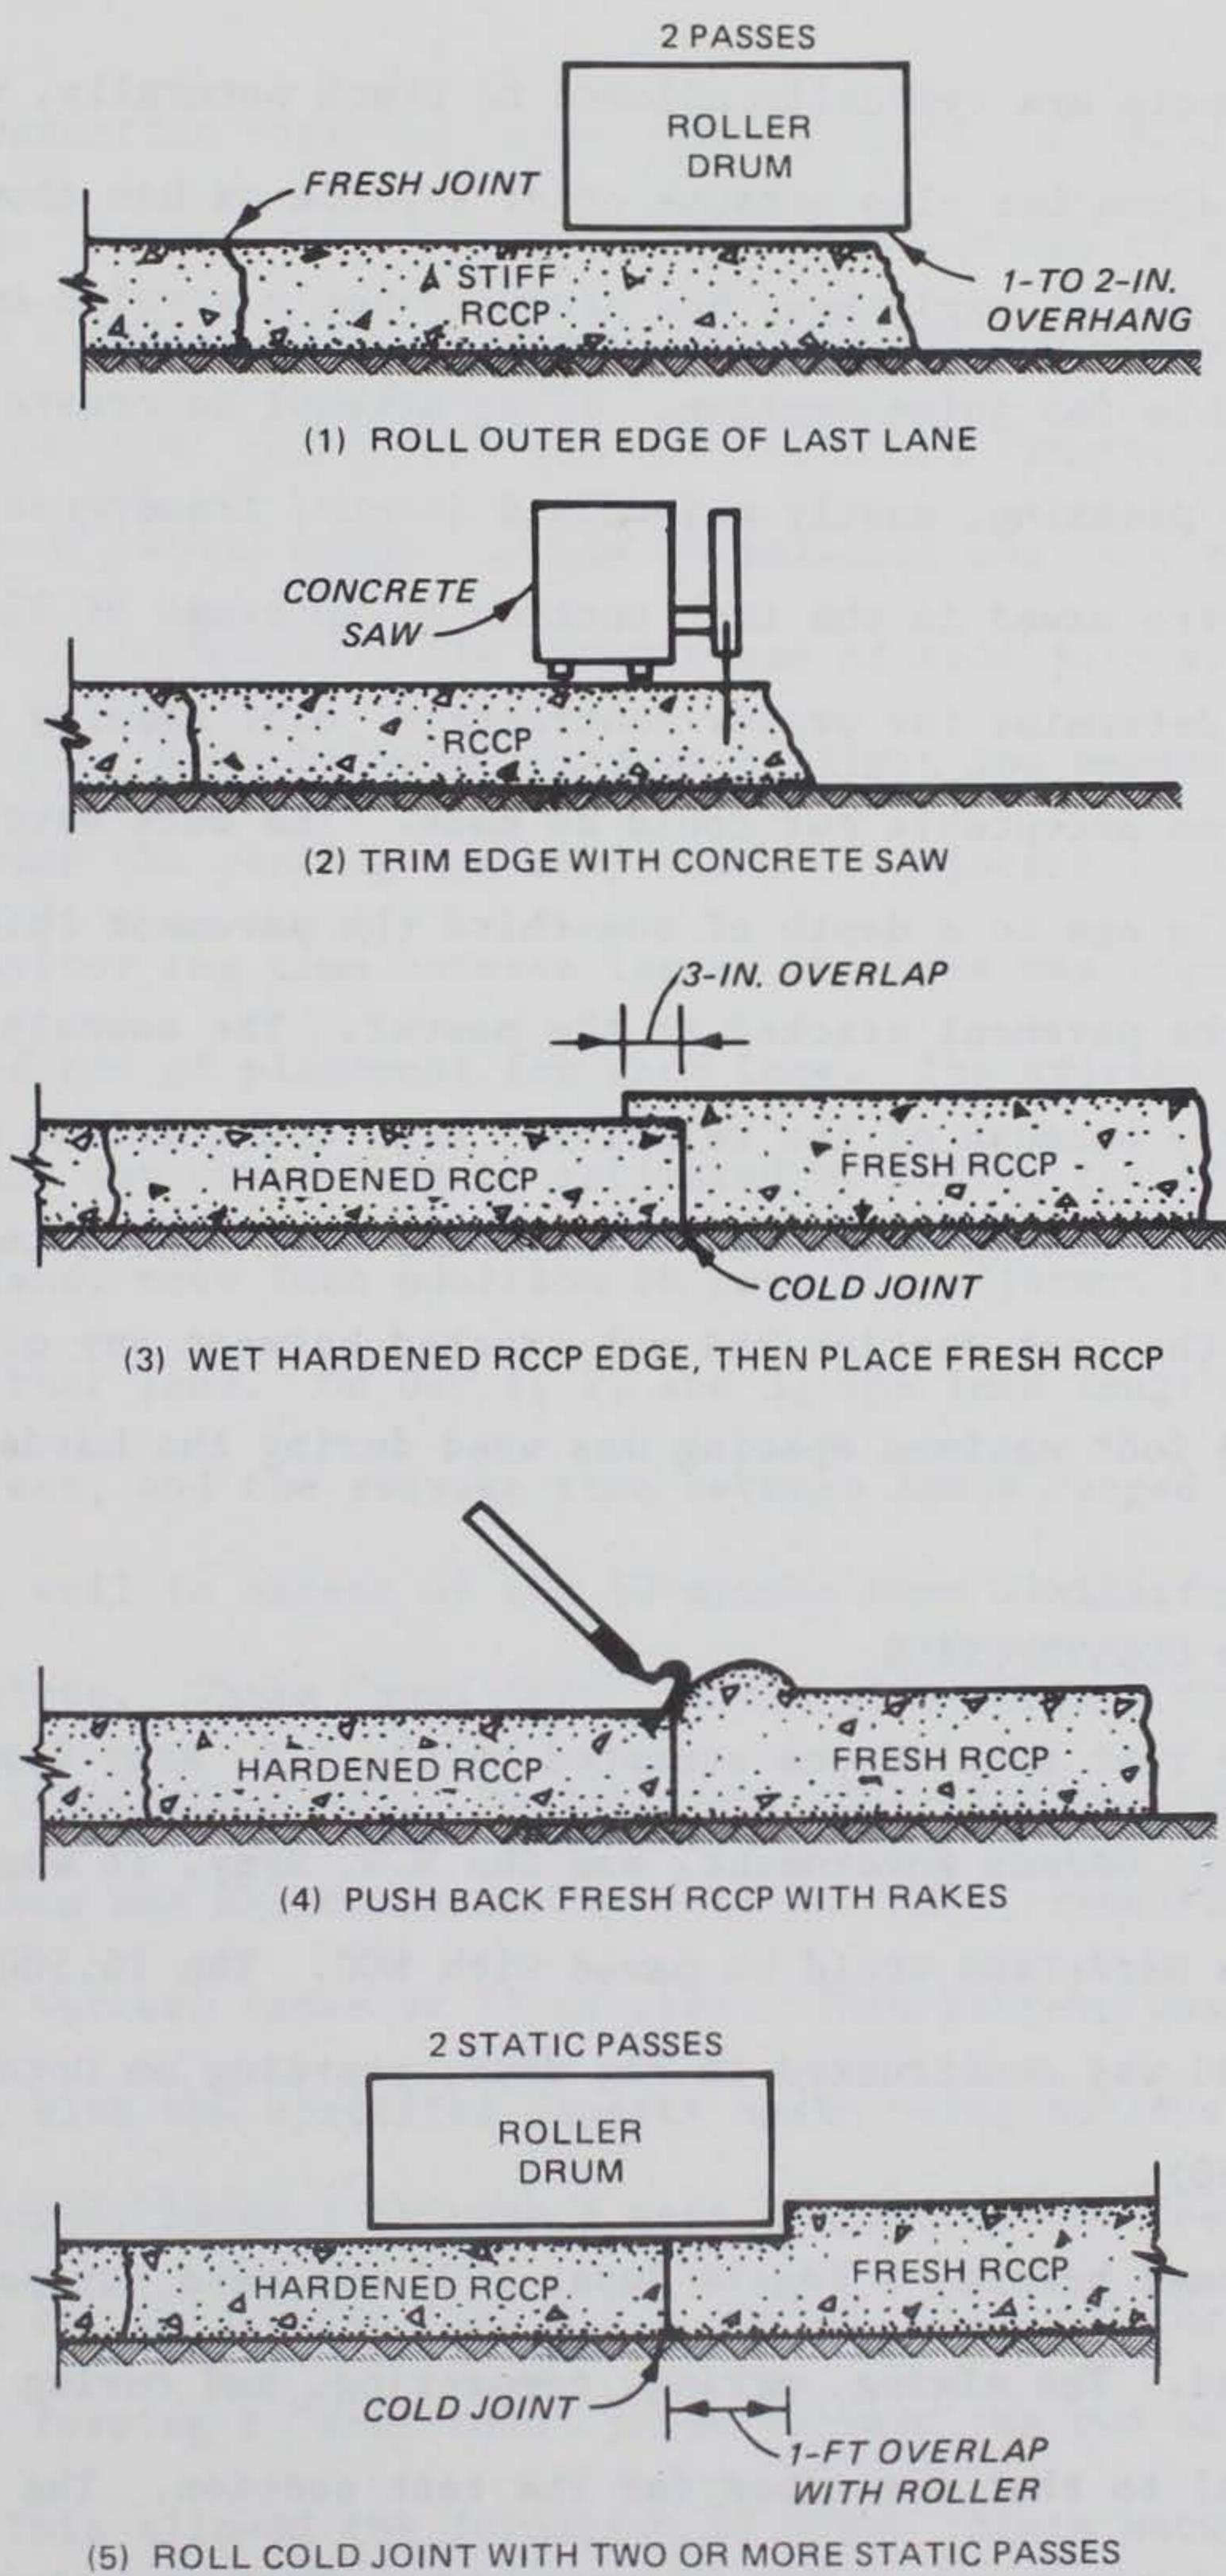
Roller Pattern: Cold Joint Construction (from Pittman 1986)
